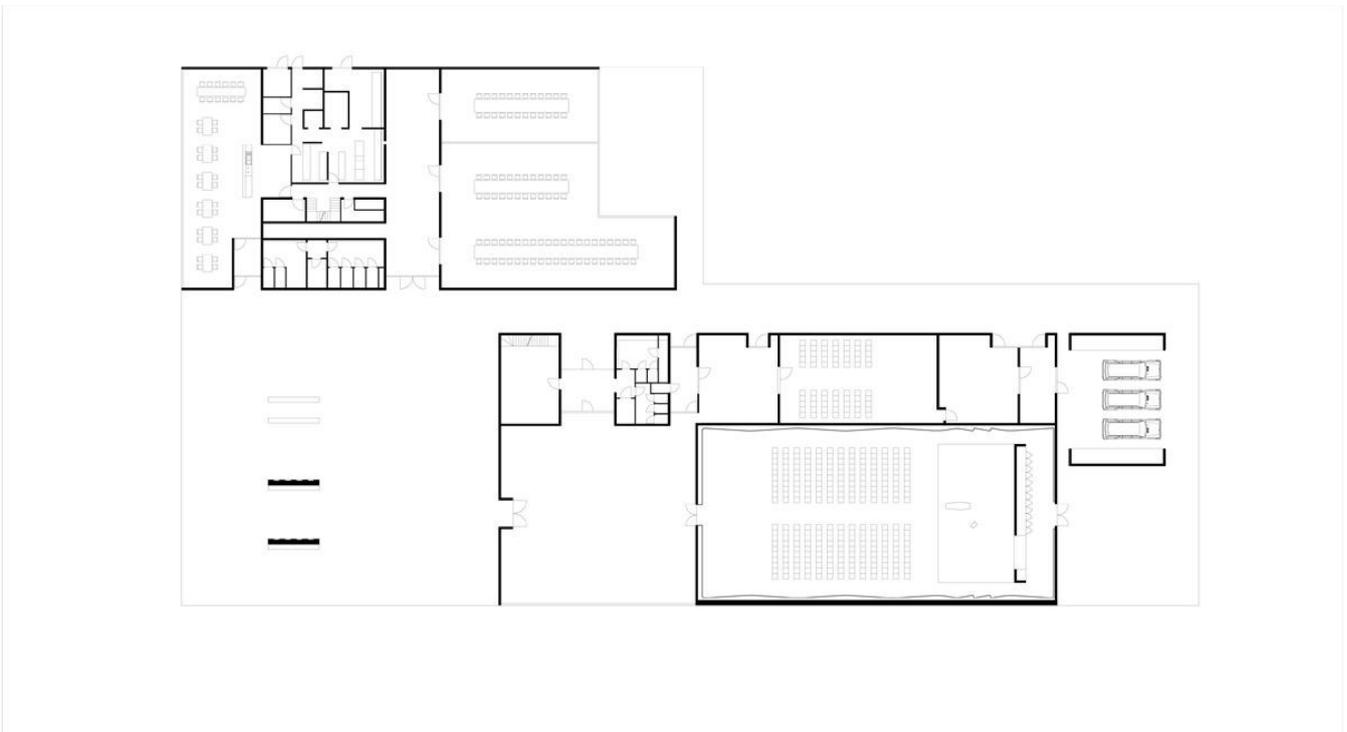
Floor Plan [[KAAN Architecten, Christian Richters, Sebastian van Damme · Crematorium Heimolen · Divisare](#)]
